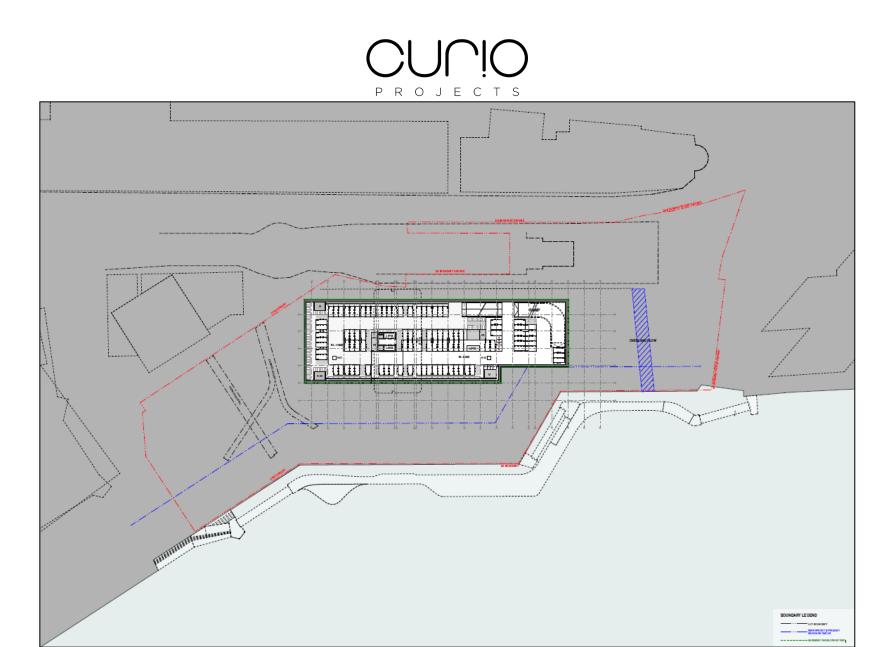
Indicative Plan Only – Basement 4 (added level) (Source: fjmt, 28/09/2020)
